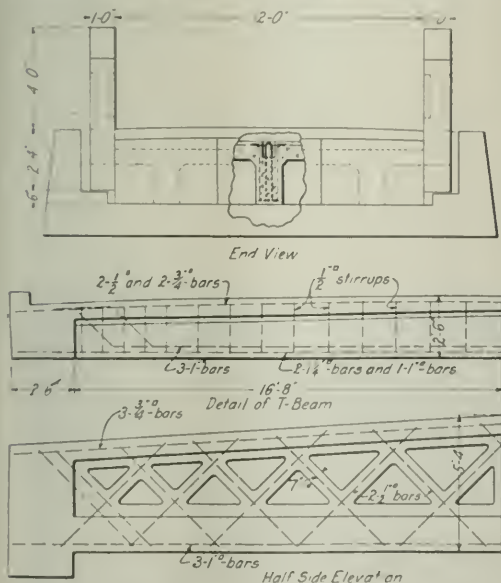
Precast Unit-Construction Is Well Adapted to Locations Where Traffic Interferes with the Use of Falsework
